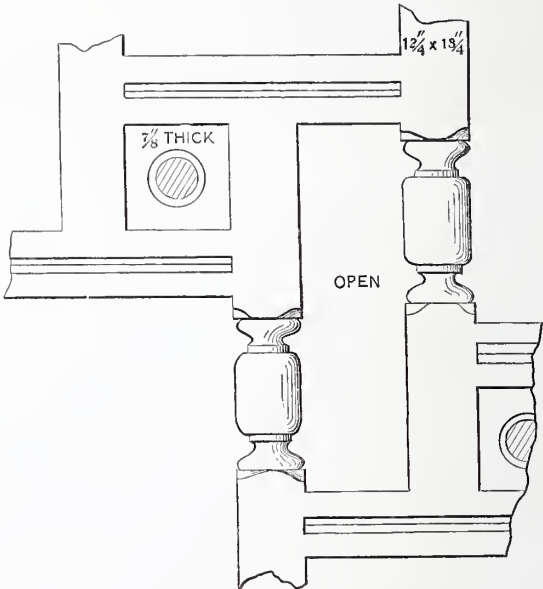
Detail of Balusters.—Scale, 2 Inches to
